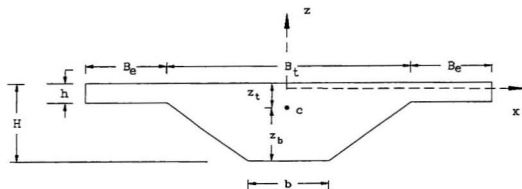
Cross Section of Ridge Beam with Ice Sheet Flanges
